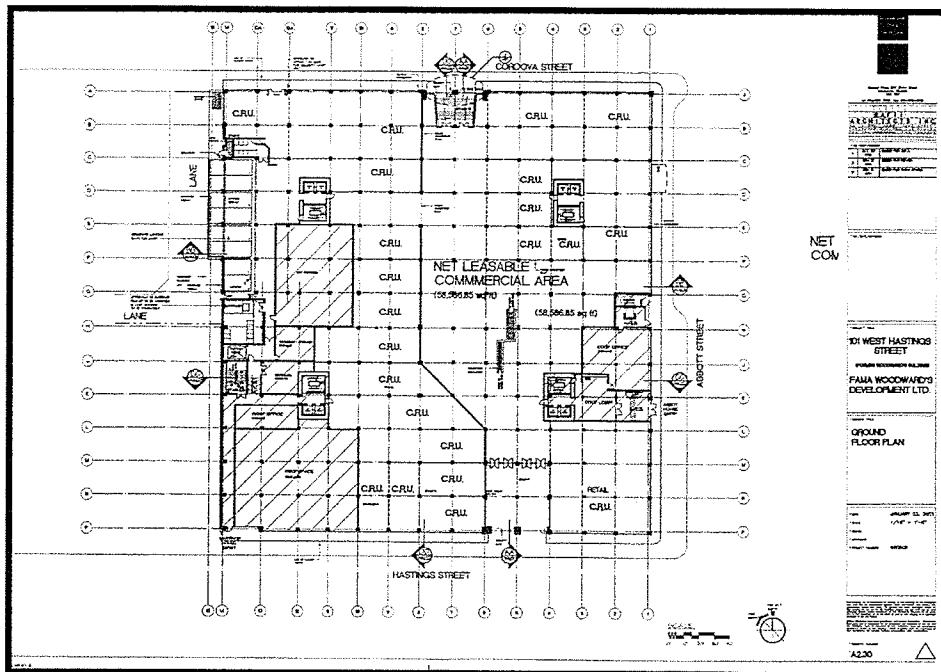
Proposed Ground Floor Plan compliments of Davidson, Yuen and Simpson.
